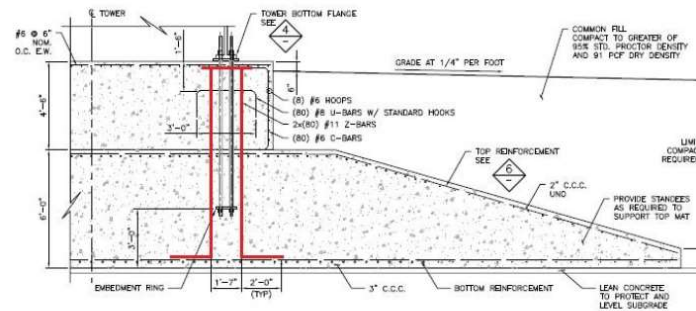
Post-2010 Foundation design example with additional vertical reinforcement.
